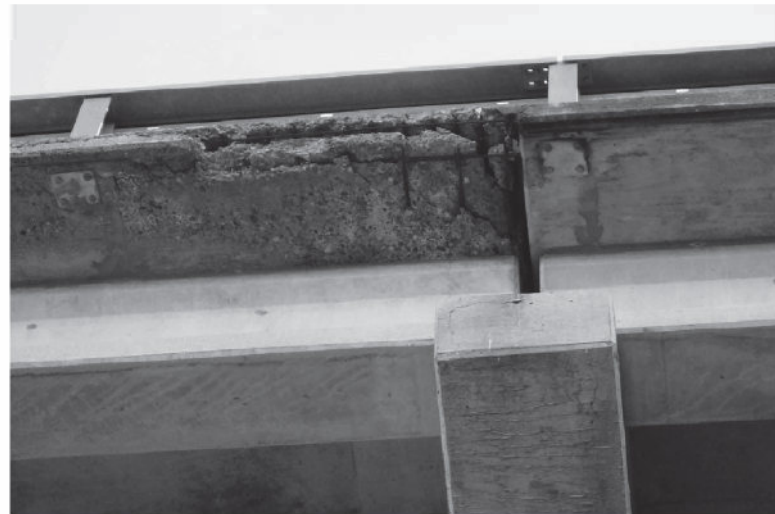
MAJOR DETERIORATION AND SPALLING WITH EXPOSED REBAR IN SW SECK OVERHANG IN SPAN #3 AT BENT #4.
